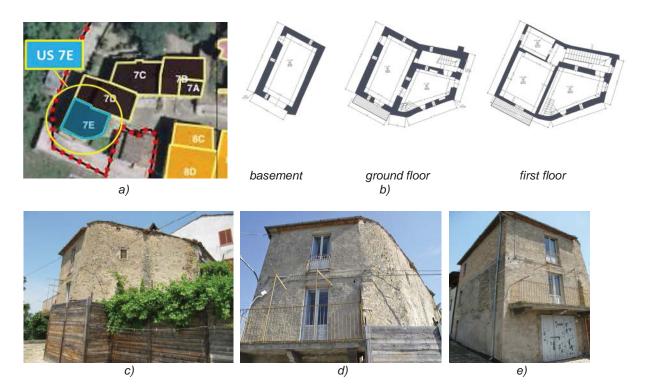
The structural unit 7E: a) plan view, b) plan layouts, c) east view, d) south view and e) west view.
